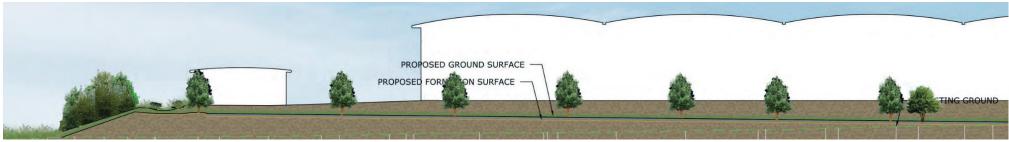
Section through proposed building, refuse and recycling unit and landscaping adjacent to railway and car park (SW to SE)
